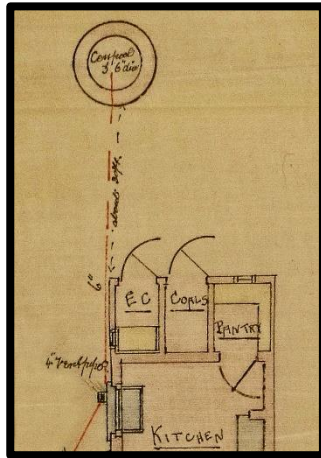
No. 2 Madras Road (1888/89) showing earth closets & cess pool (CA CB/2/SE/3/9/128).
